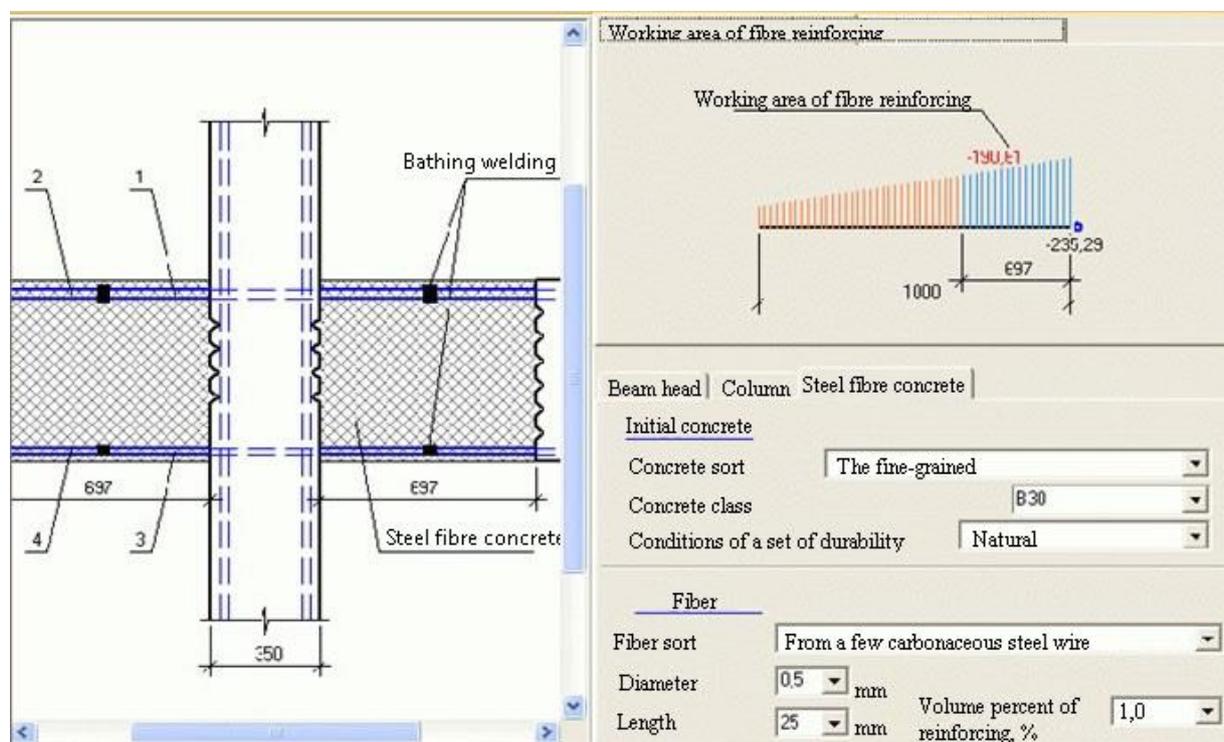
“Earthquake protection” module GUI. Determination of SFRC grouting zone of beam-column joint with compound reinforcement: 1, 3 — joint working reinforcement $\varnothing 25$ A400; 2, 4 — beam protruding reinforcement $\varnothing 25$ A400.
